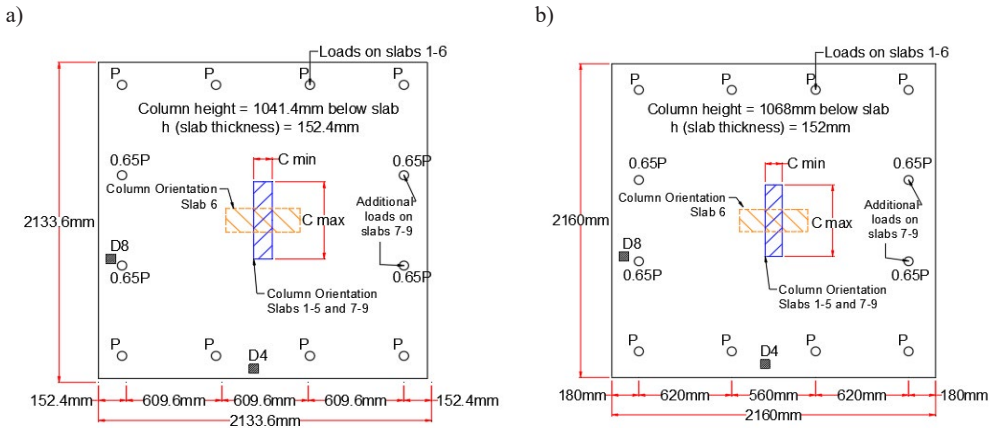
a) Experimental specimen dimensions and loading [8], b) modified dimensions
